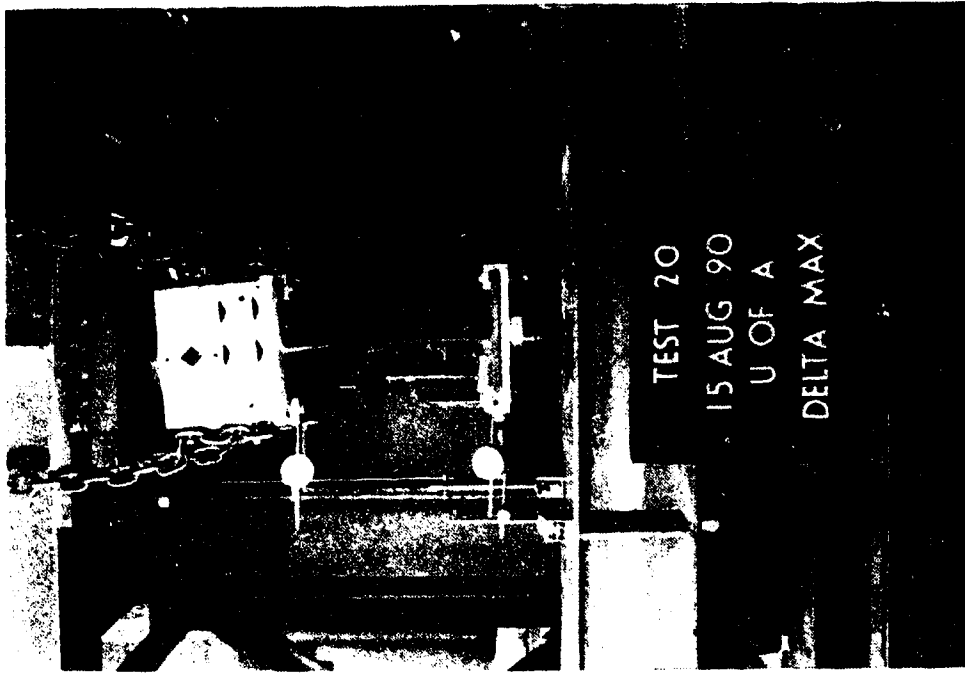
End view of distorted cross section at the cantilever tip, test 20
